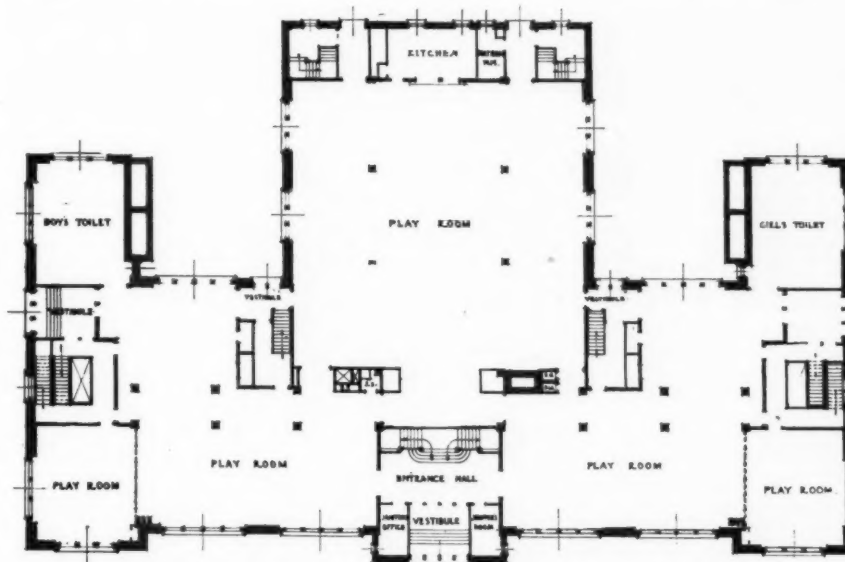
FIRST FLOOR PLAN. TYPE "A" ELEMENTARY OR INTERMEDIATE SCHOOL
